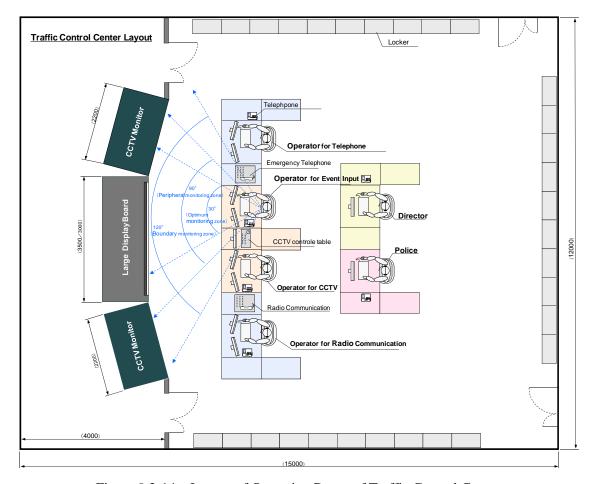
Layout of Operating Room of Traffic Control Center
